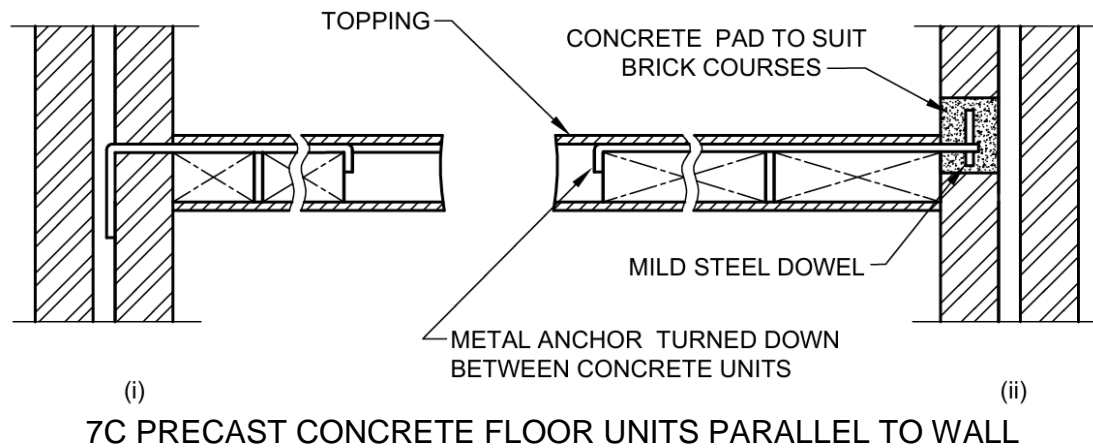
TYPICAL DETAILS FOR ANCHORAGE OF CAVITY WALLS
